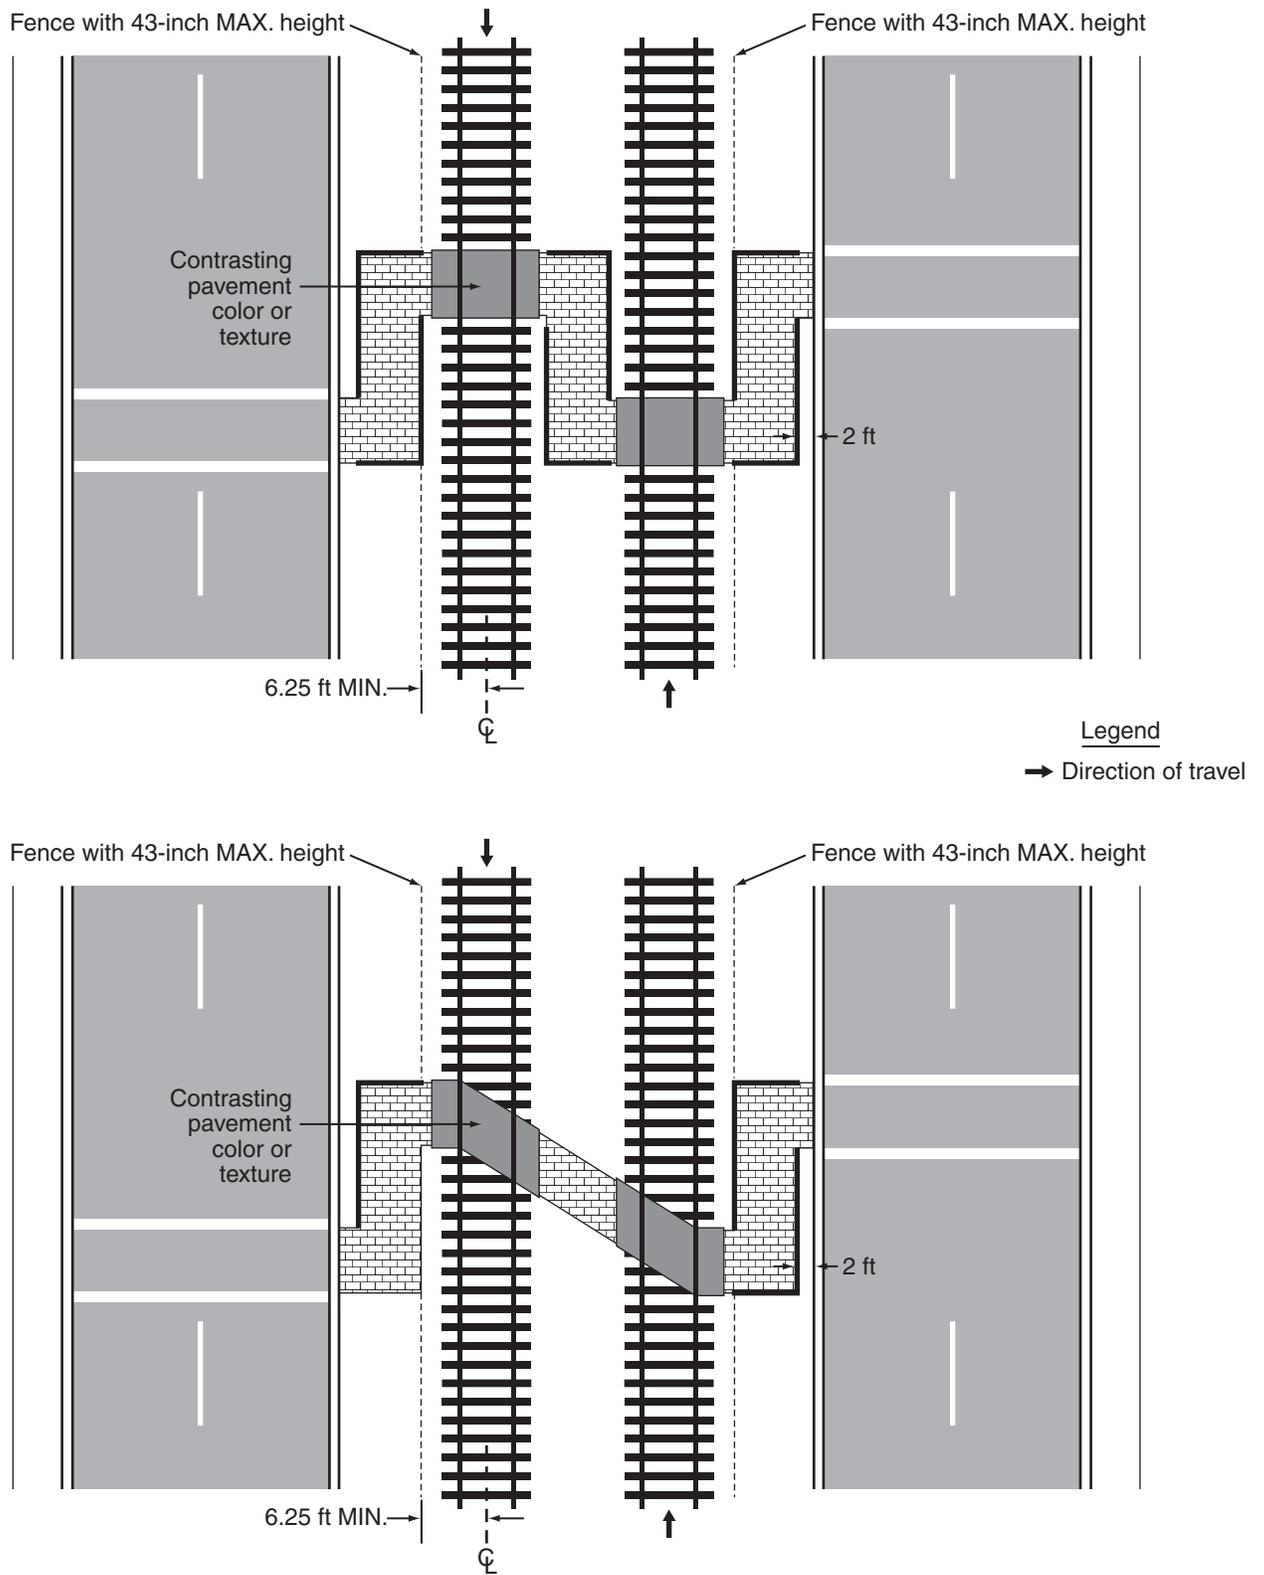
C-10. Examples of Pedestrian Barrier Installation at an Offset Non-Intersection Grade Crossing
